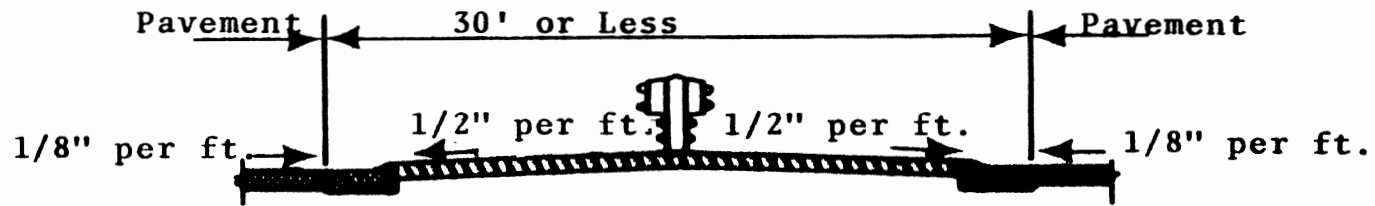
TYPICAL MEDIAN CROSS SECTION WITH CURBS A, B, OR D,
